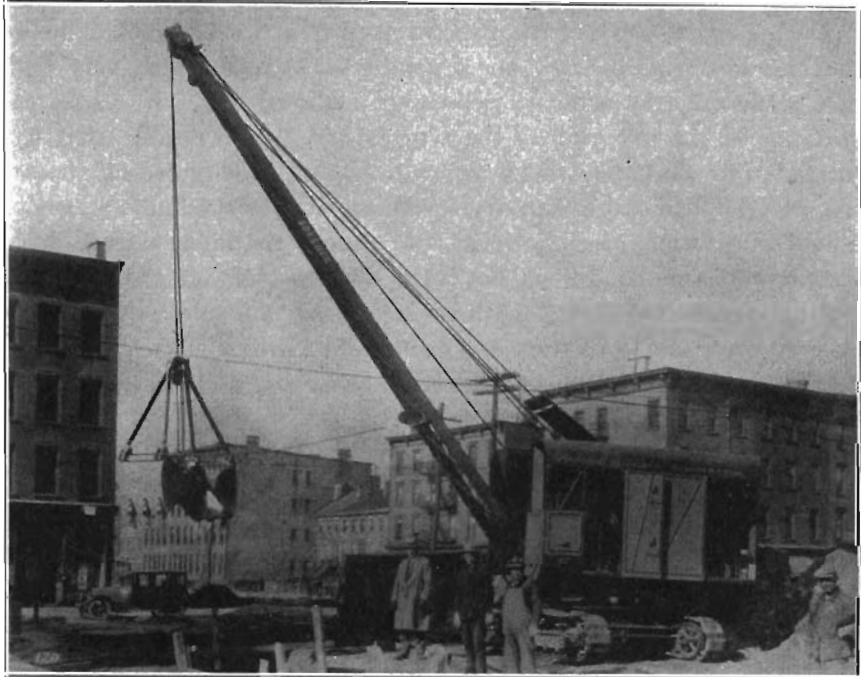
Crane equipped with clamshell bucket. Courtesy Speeder Machinery Corporation, Cedar Rapids.
